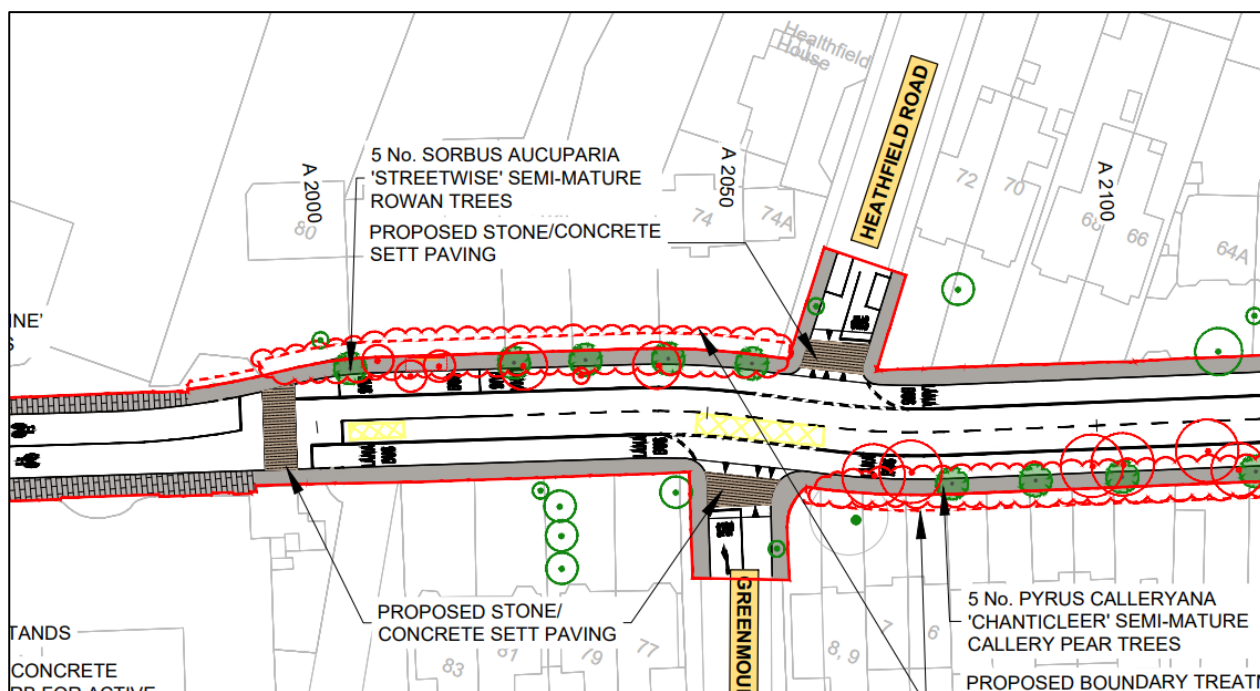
Landscape General Arrangement Drawings at Terenure Road East
